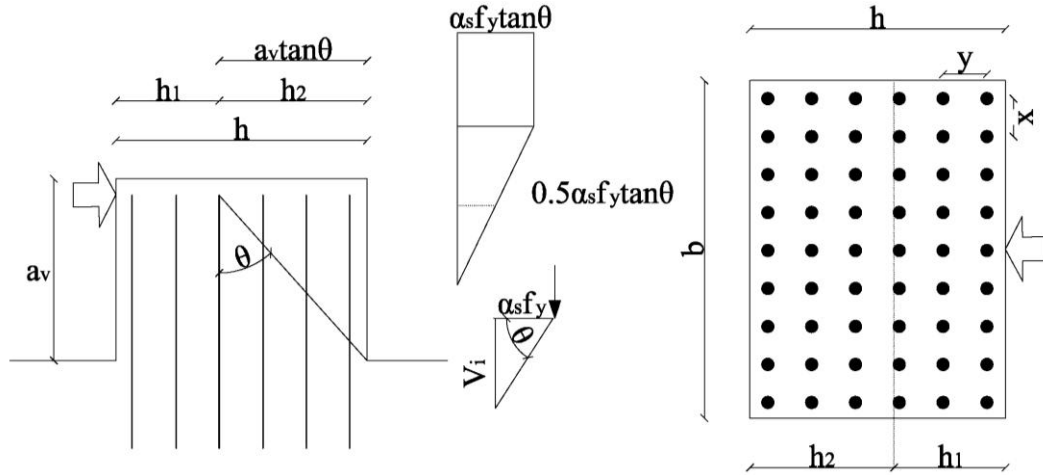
Corbel's characteristics and arrangement of reinforcement in plan.
